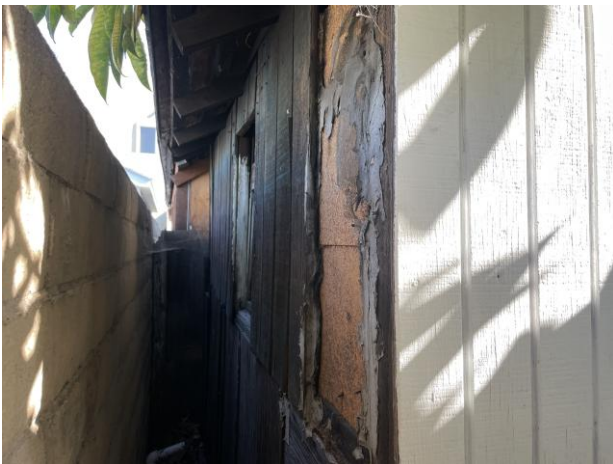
Rear (west) façade (left) and south façade (foreground) of the garage showing different cladding, view north. Note the expansion to enclose the eave at the north bay visible in the background.
